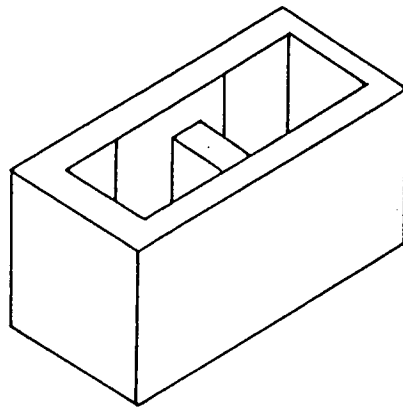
Details of a typical blockwork masonry column used in the investigation.
